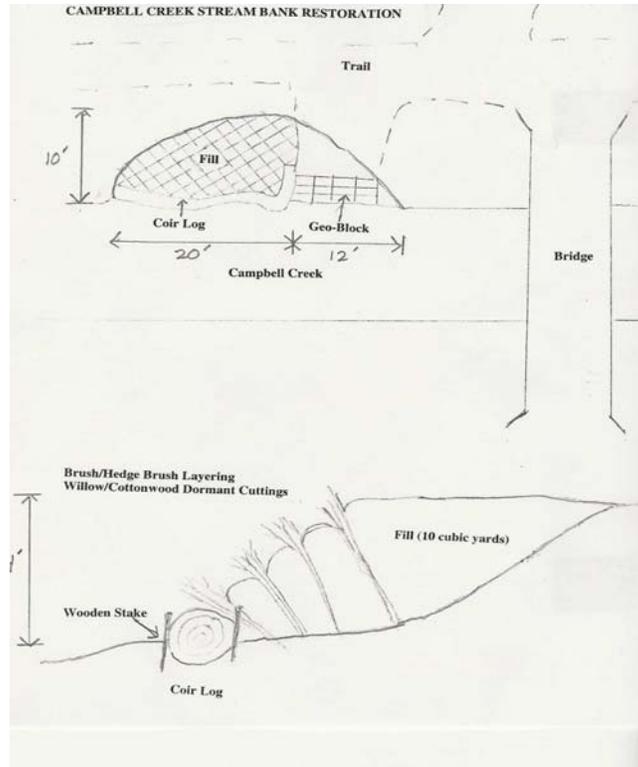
, Plan and side view of proposed action at Restoration Site 2.
